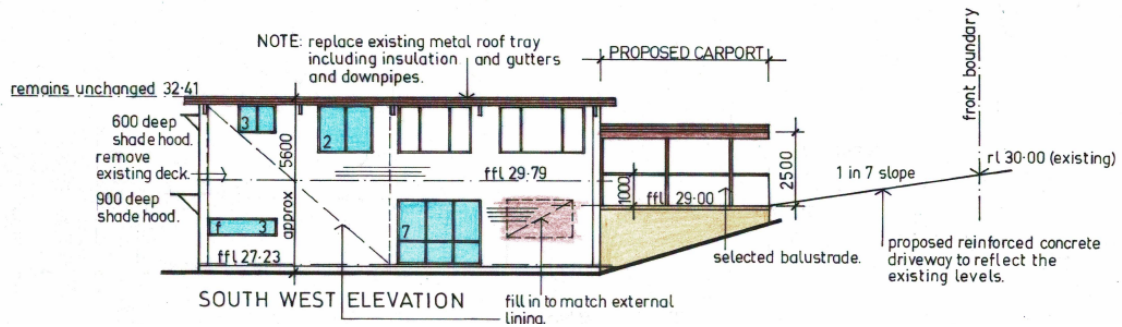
South-Western elevation (Source: Living Architectural Planning)
